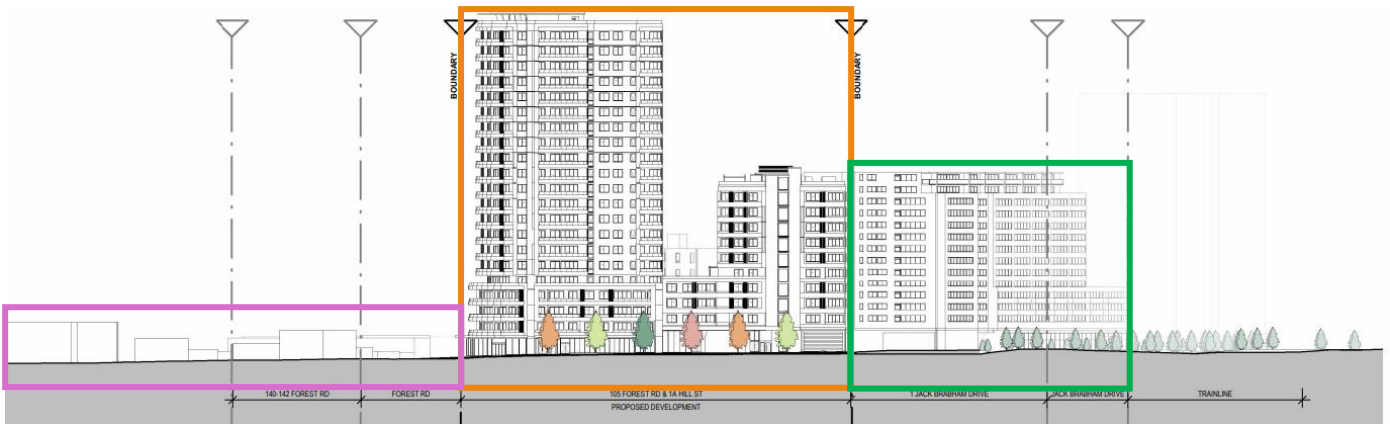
Street elevation along Hill Street – Proposed development (highlighted orange) with the adjacent residential flat building (highlighted green) immediately east of site and the retail/commercial developments on the opposite side of Forest Road (highlighted purple) (Source: DWA, 2025)
